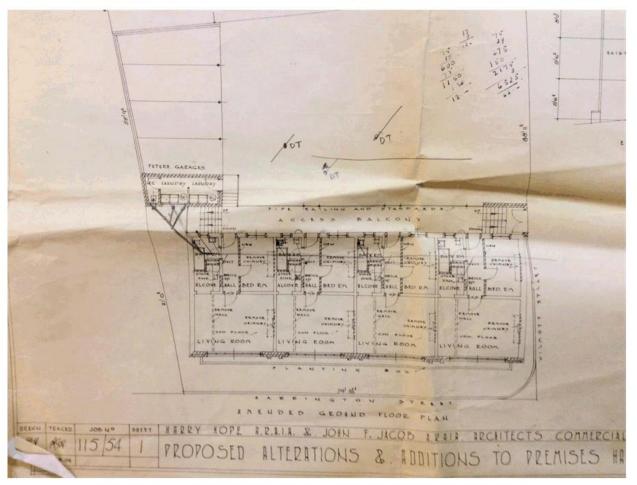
Proposed ground floor plan of the flats, being the converted Wilmot Terrace basements.
